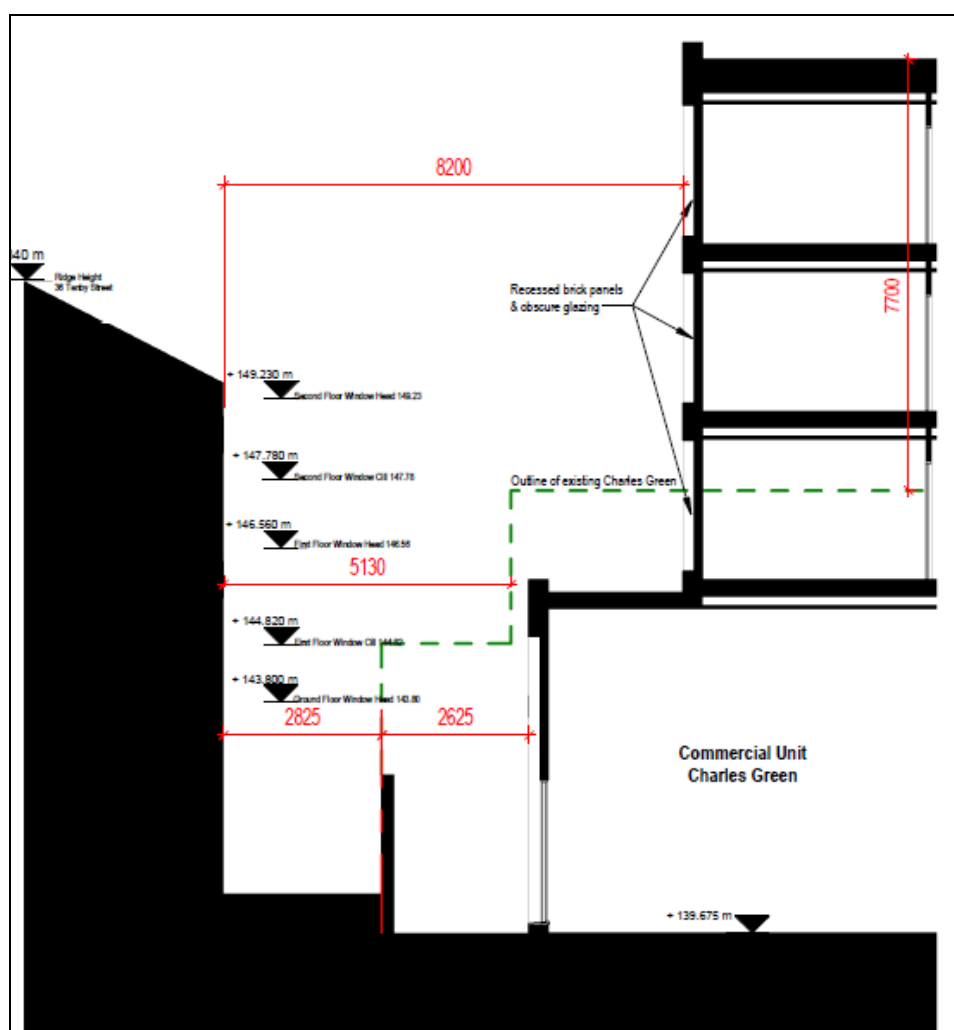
Section showing existing and proposed relationship to 36 Tenby Street
